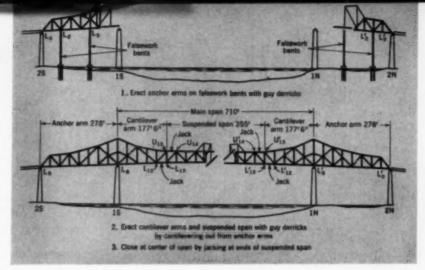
Erection procedure for main span starts with anchor arms, which are assembled on falsework between Piers 1 and 2. When trusses have been landed on main piers, they are self-supporting, and channel span is erected by cantilevering to center of span. Jacks at ends of suspended span permit adjustment during closure operation.
